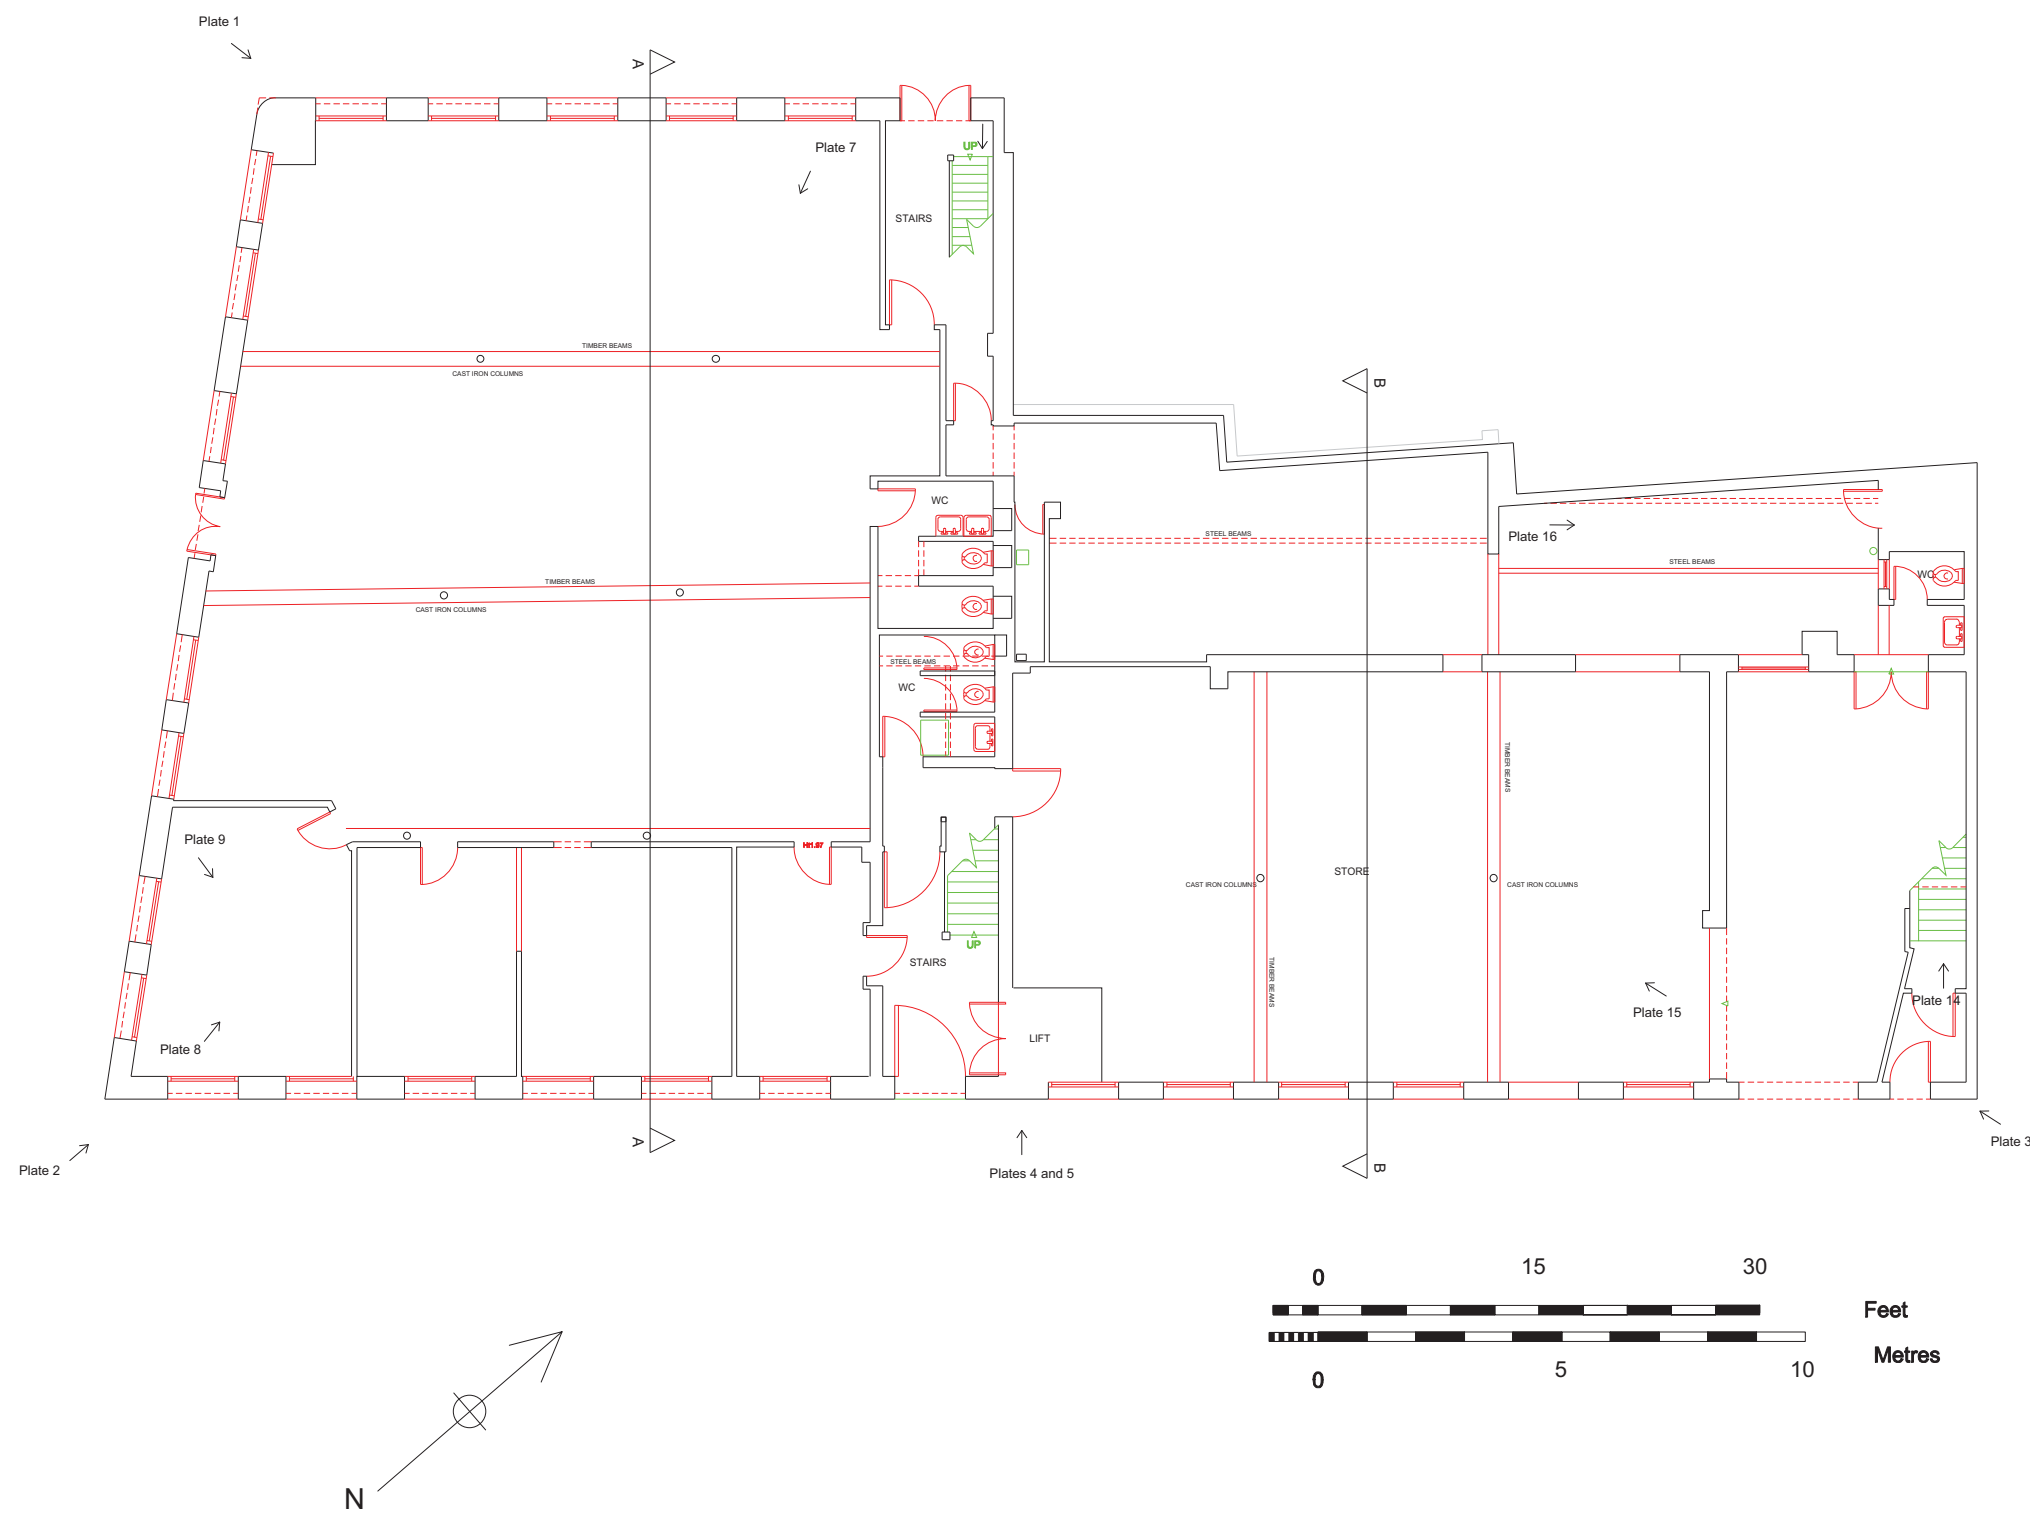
25-27 Bede Street Ground Floor Plan with plates located (based upon plans supplied by SV Surveyors Ltd)
